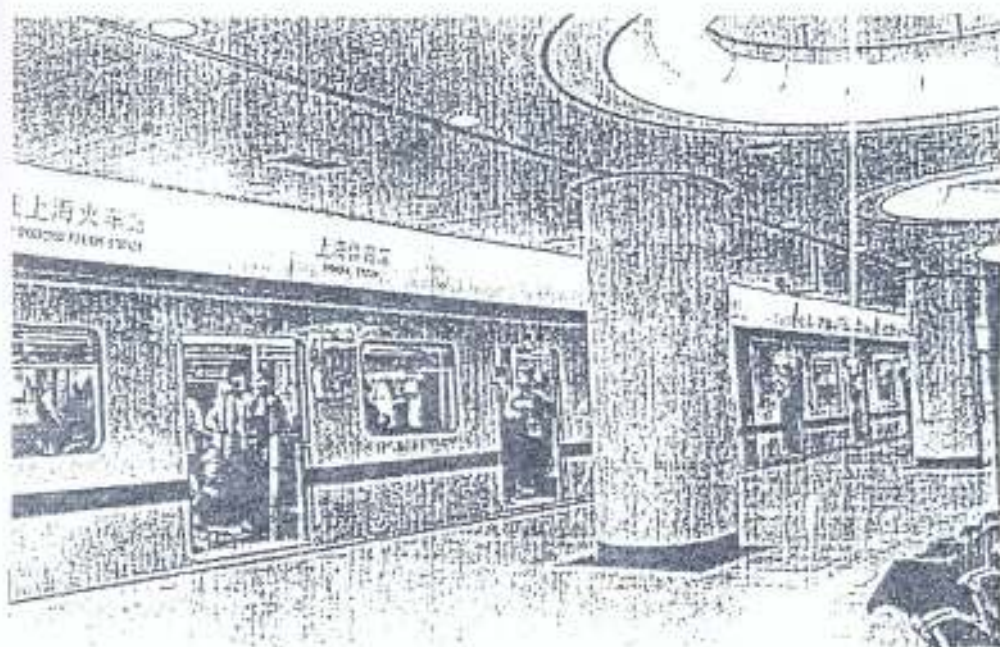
A metro station (Shanghai, China) where there are columns to support the structures over the underground station. The station is bright and columns do not seriously obstruct the platform
